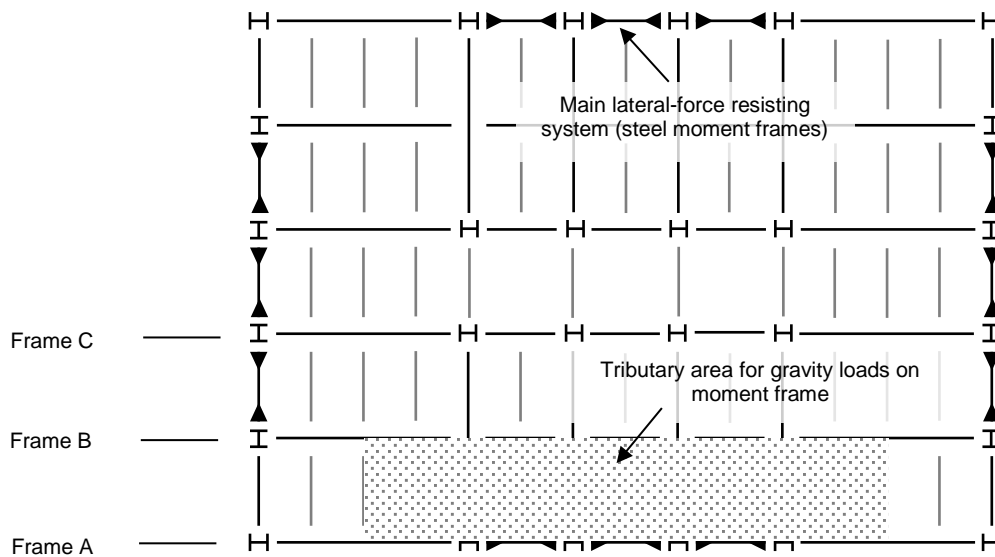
Type I non-ductile and ductile moment frame 1-story, 2-story, 4-story, and 8-story building framing plan
